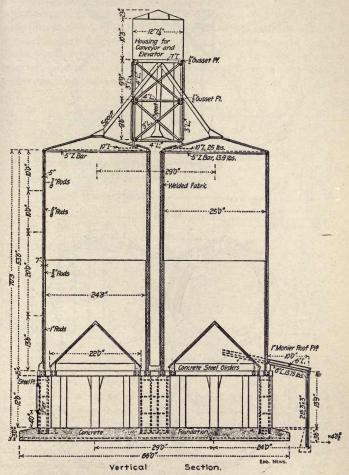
Section of Cement Storage Bins, Illinois Steel Co., Chicago.
